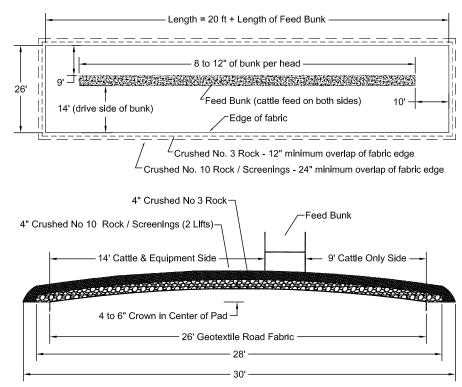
Geotextile Fabric and Gravel Construction for In-Pen Feeding Pads (top view and cross-section)
